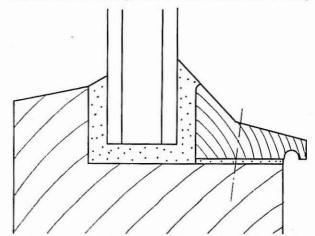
Proposed bottom bead for horizontally pivoting windows as well as top- and bottom-hung windows.
